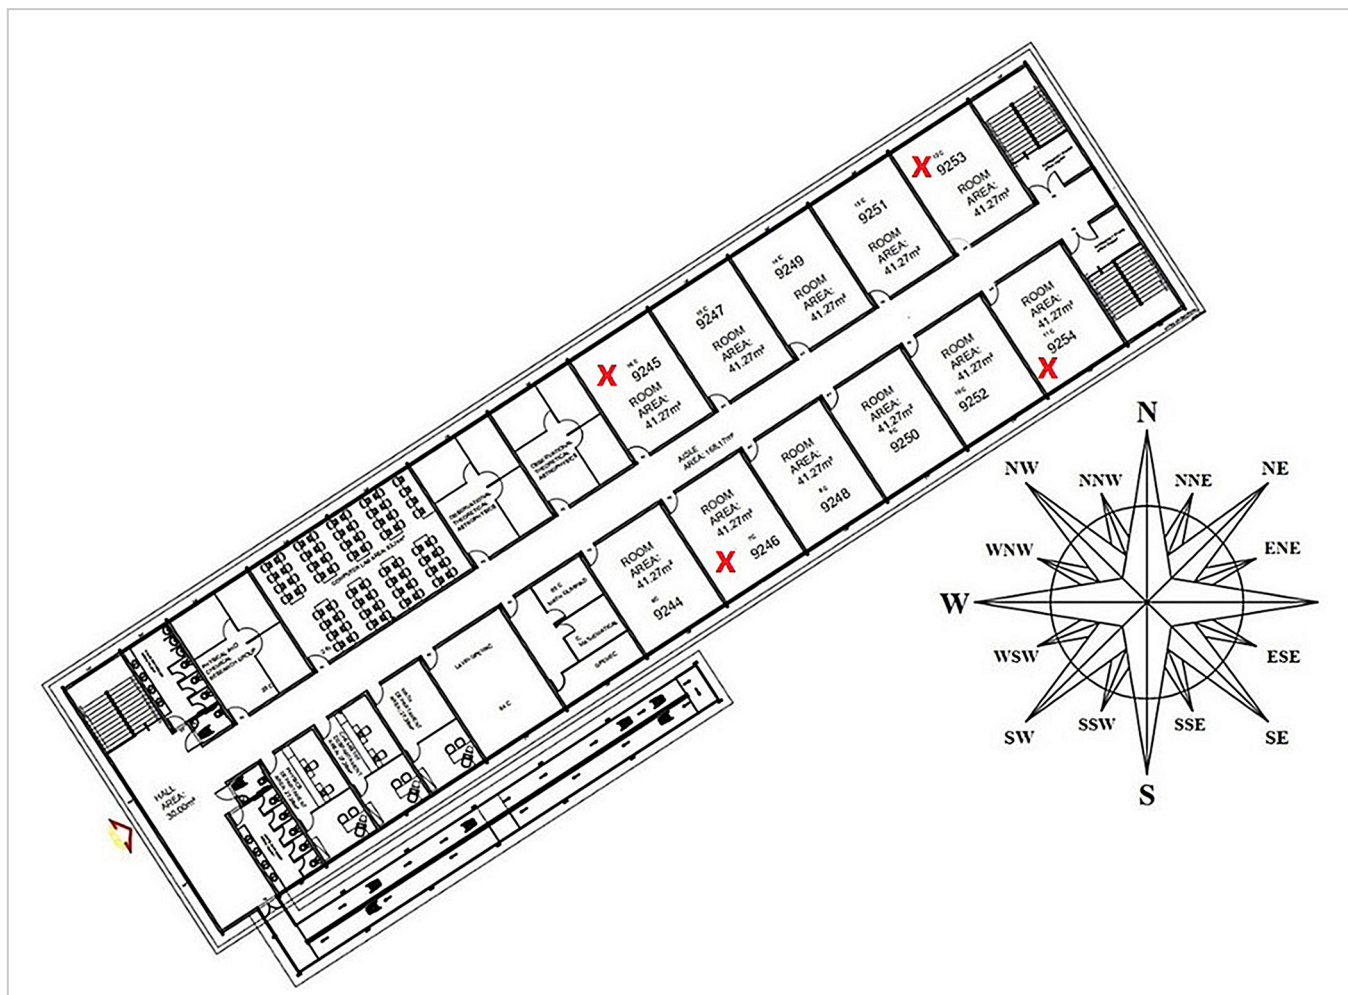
Measurement points on the 2nd floor of the ETS building.
